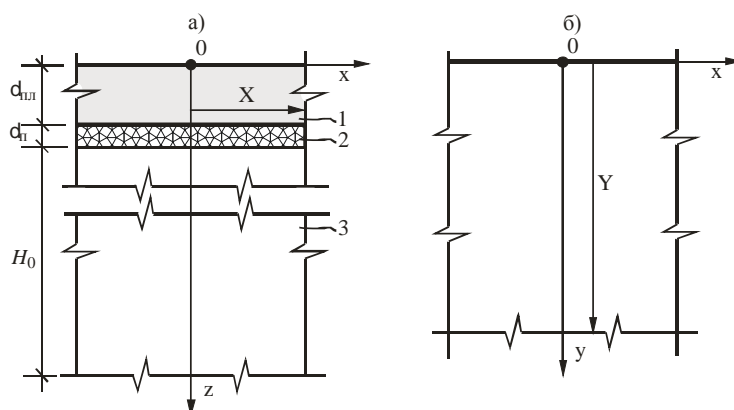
The calculated fragment of a concrete foundation slab: a) in a section; b) top view: 1 – foundation plate; 2 – concrete + sandy priming; 3 – foundation soil
